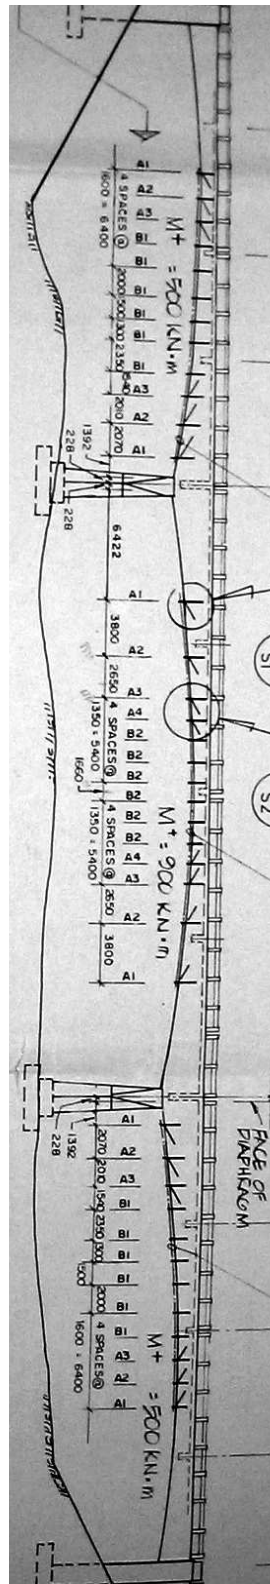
Elevation of Red Deer River Bridge (Reid Crowther and Partners Ltd. 1989).
